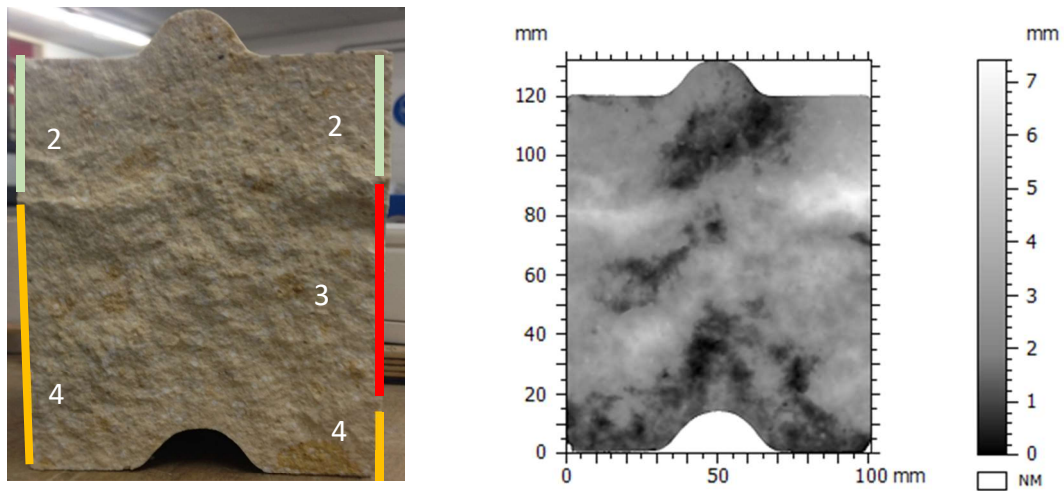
Fracture surface of XL2 ZY1.
